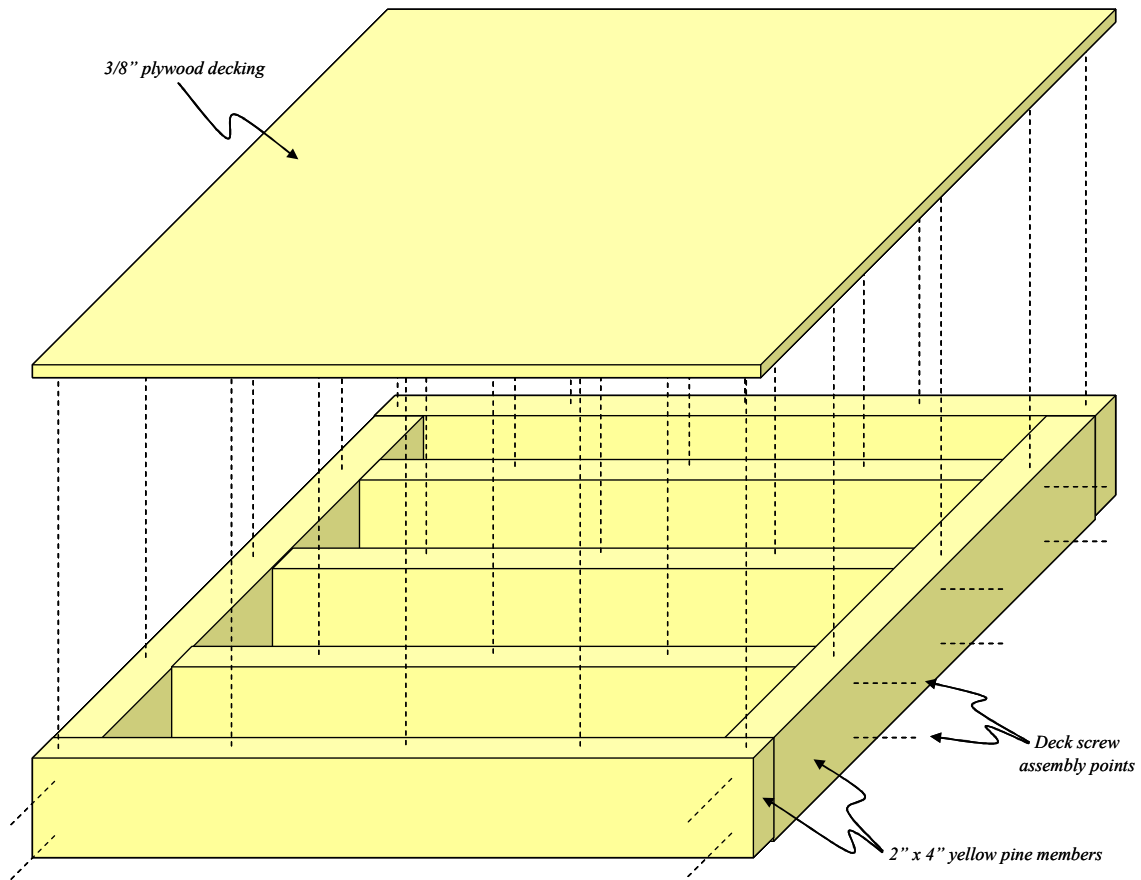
Wood subfloor assembly schematic (dashed lines are screw down points) used to create wood frame subfloor for testing.
